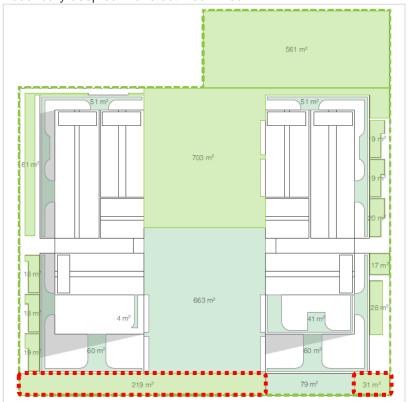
Extract of overall landscaping and deep soil landscaping plan, with deep soil landscaping along southern boundary outlined red (Source: Silvester Fuller)
